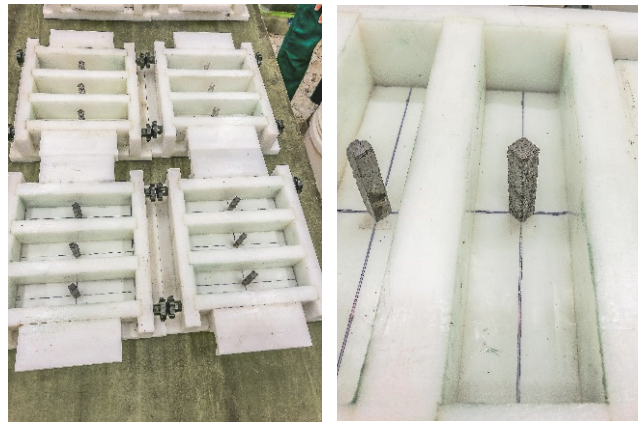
Moulds defining the final shape of the specimens with fixed rock inclusions.
